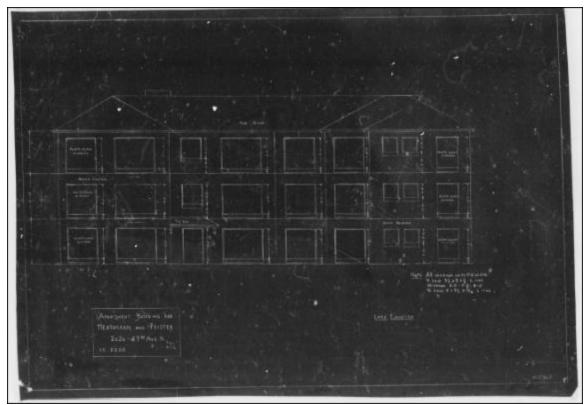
"Apartment Building for Heathman and Peister 2020-43rd Ave. N. ... [Building Permit] 412969" Lake Elevation
